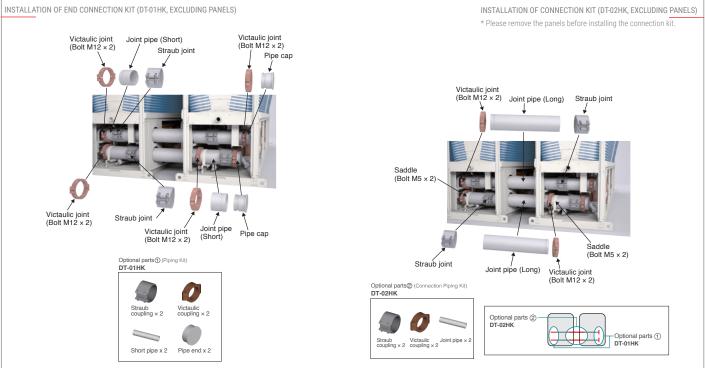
## DETAILS OF BUILT-IN HEADER TYPE MODULES
